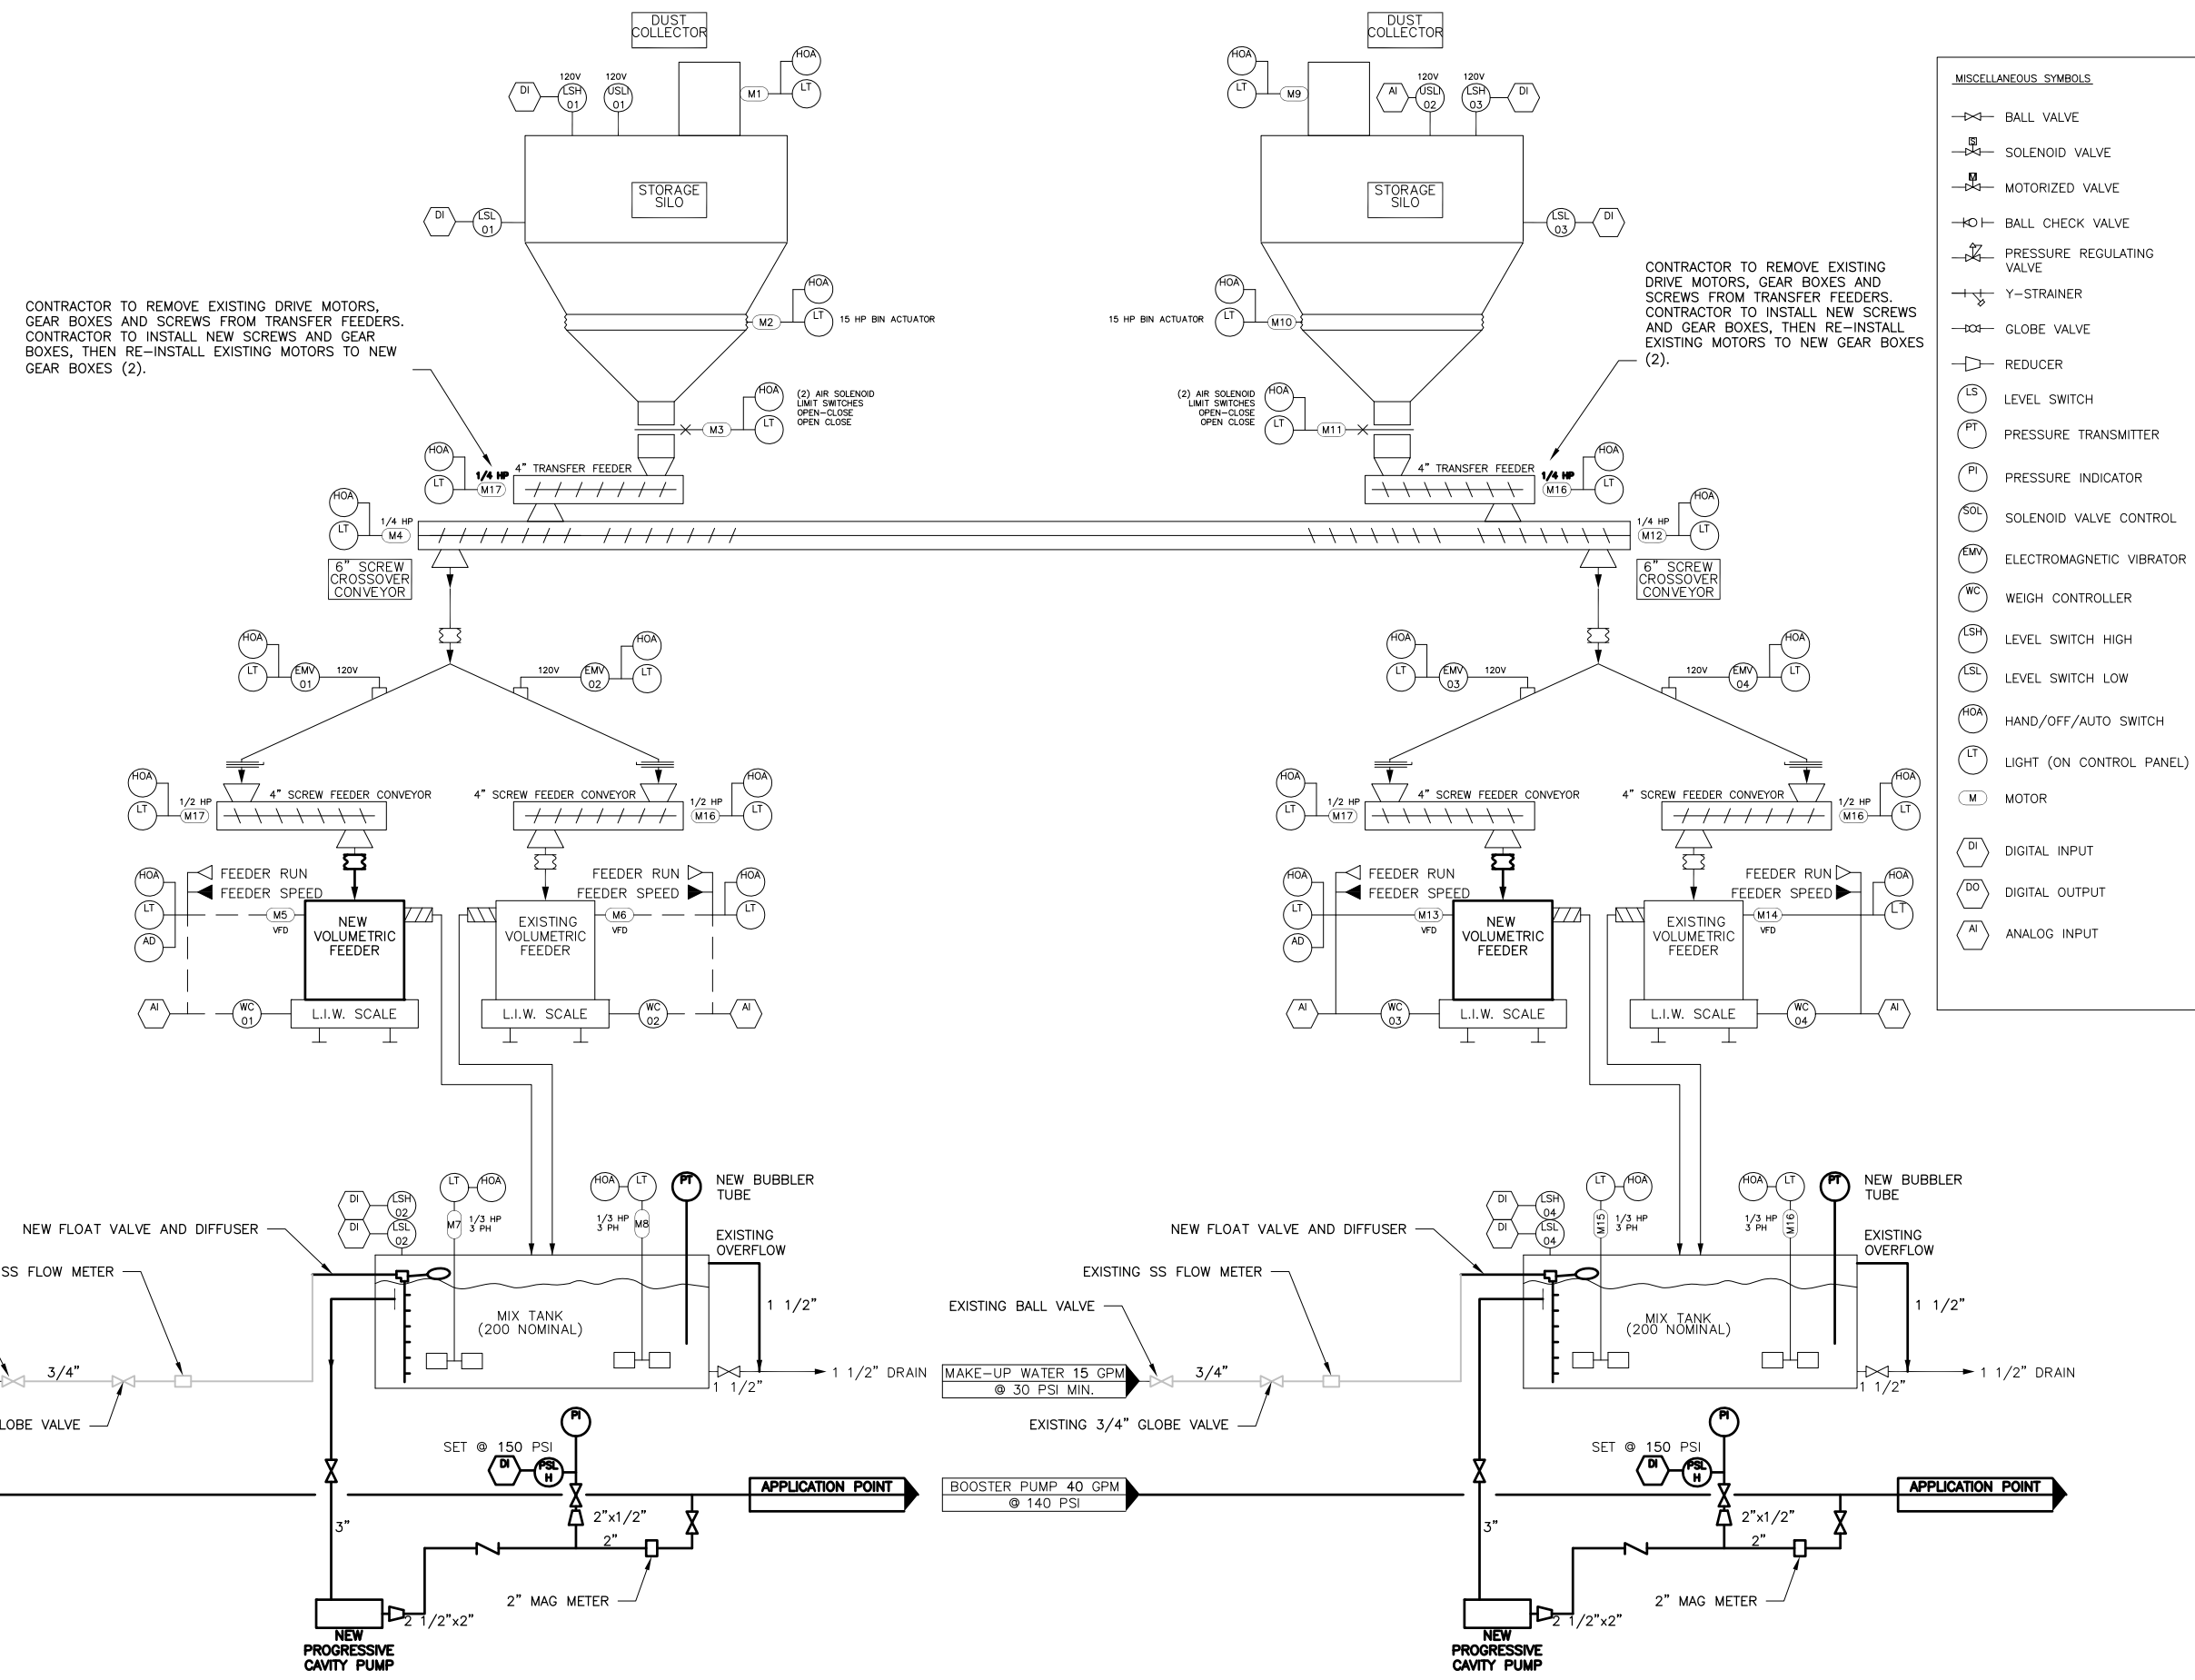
shows the site plan of these improvements. Figures 4-7 and 4-8 show the general layout and a schematic of the new PAC feed improvements.
